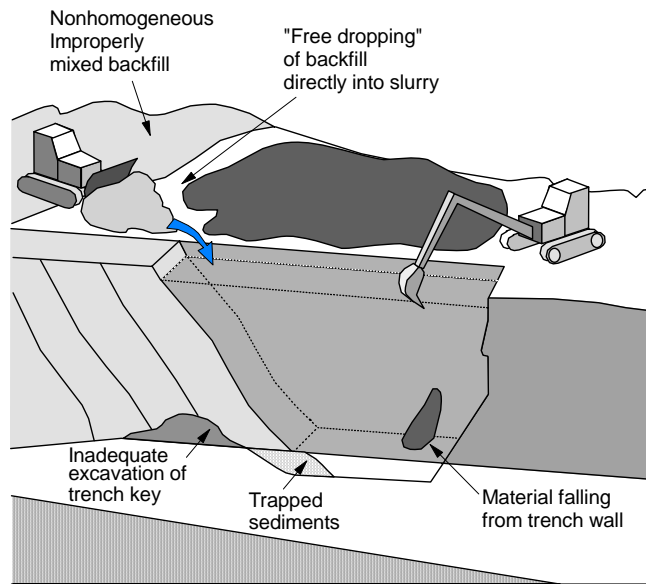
Potential defects in slurry trench cut-off walls
